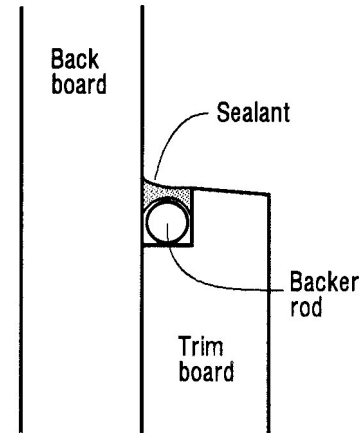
In this cross section view a dado in the trim board forms a groove to hold the foam backer rod and sealant. Tuck the backer rod into the groove first. Then apply the sealant which conforms to an hour-glass shape that is both flexible and firmly bonded to the wood trim.
